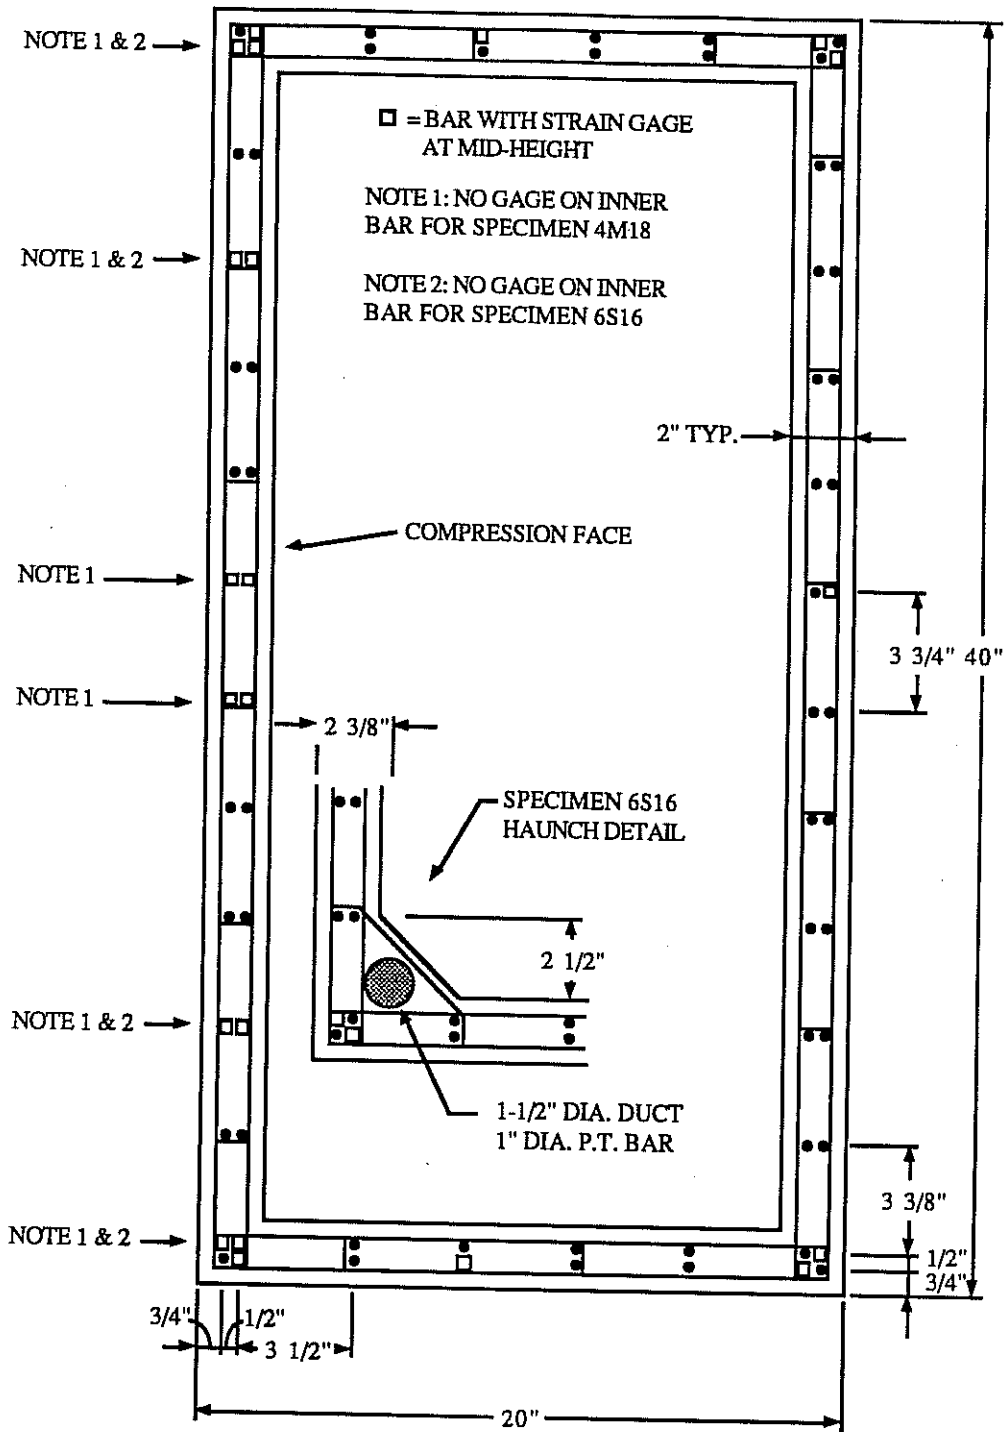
Cross Sections for Specimens 4M18, 6S16 and 10ML18
